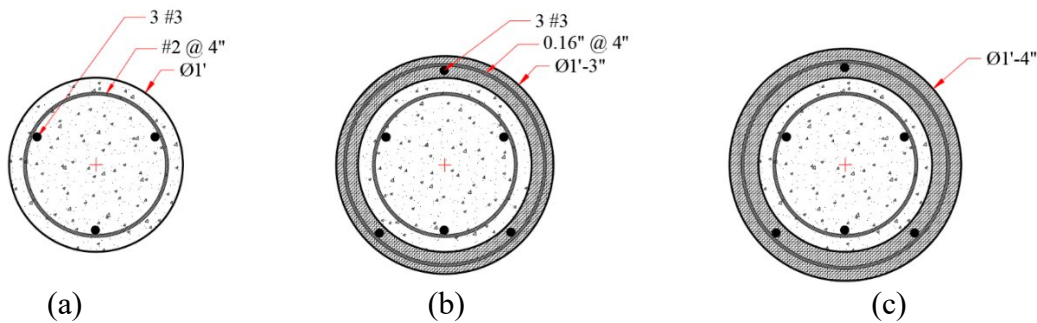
Dimensions and reinforcement details of a) original column b) repaired column with 1.5-in.-thick jacket, and c) repaired column with 2-in.-thick jacket (Hossain et al., 2023)
